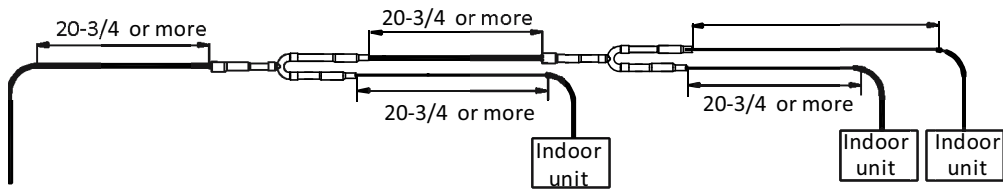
Branch Joint Spacing and Separation from Bends (unit: in)
